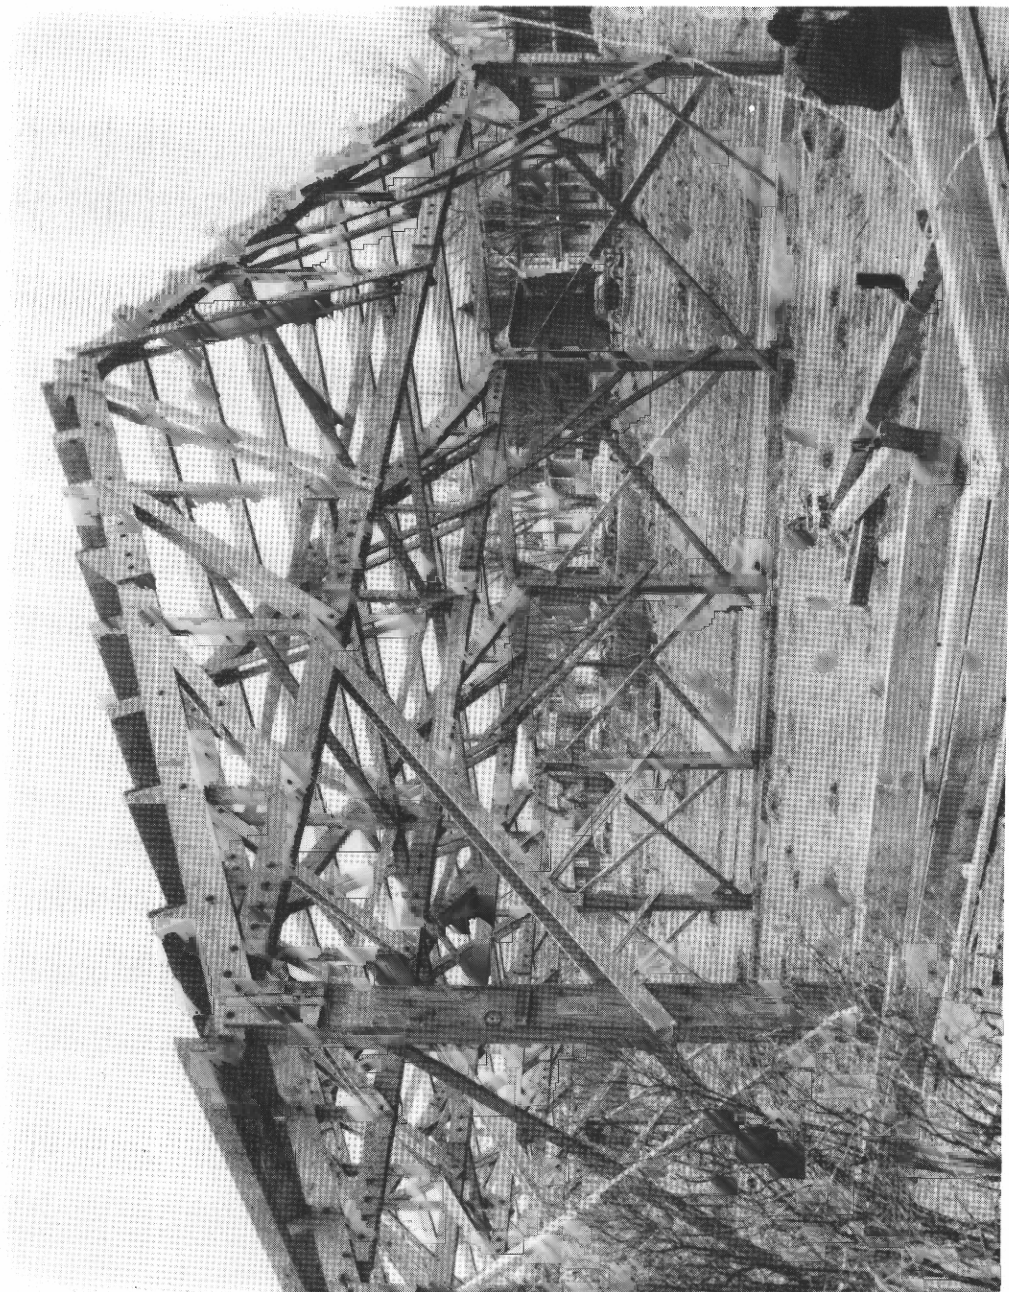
Wood roof trusses and structural columns from an Army ordnance plant in Illinois re-erected at the University of Wisconsin. Span 50 feet.
